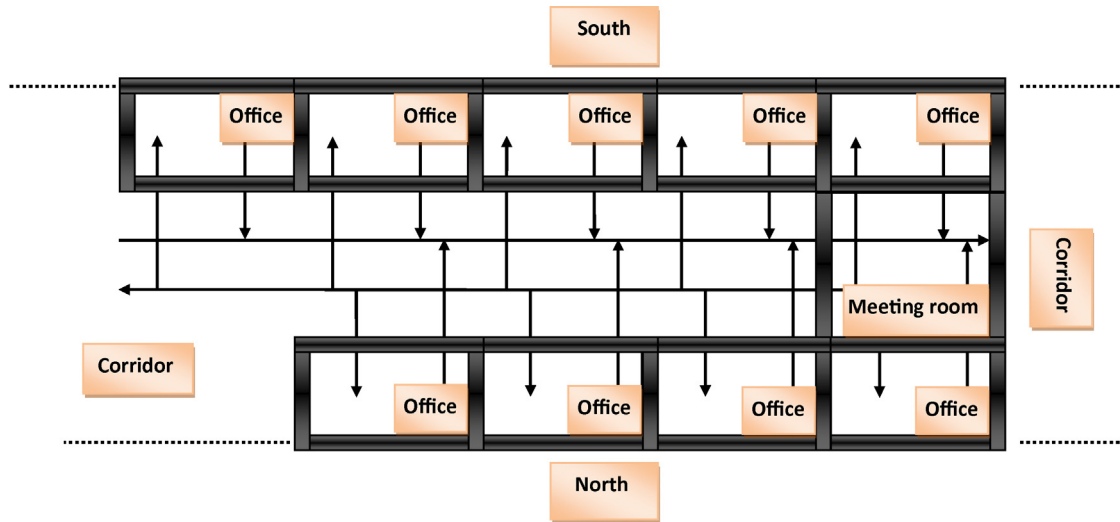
Layout of the modelled building with associated duct system for supply and exhaust air ventilation.
